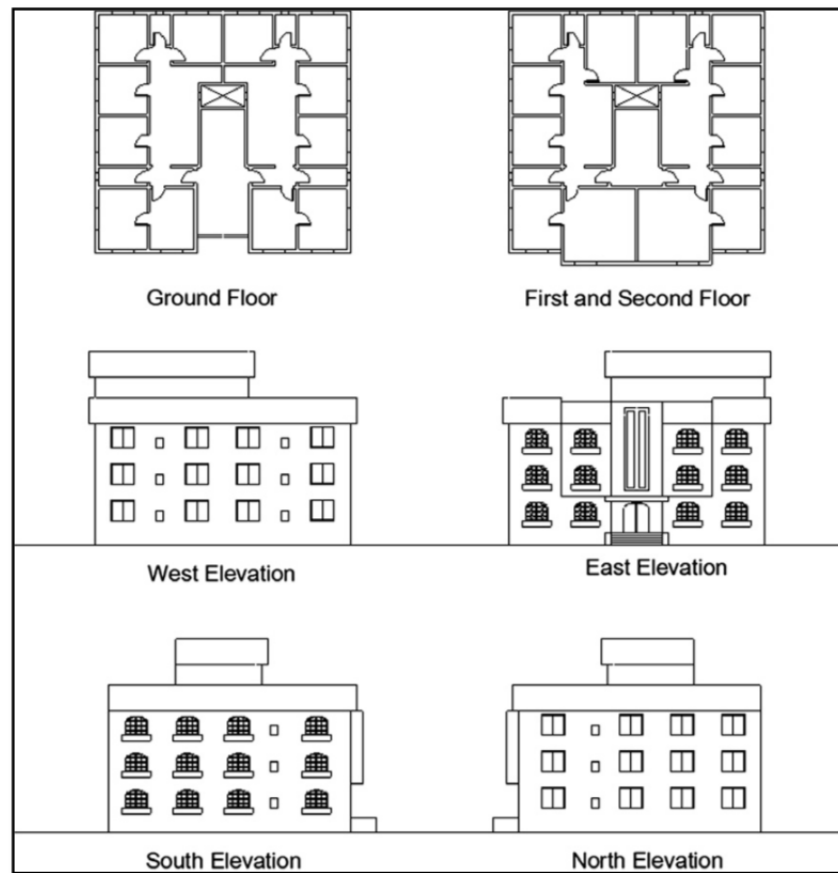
Floor plans and elevation of case study 3 (Taleb & Sharples, 2011).
